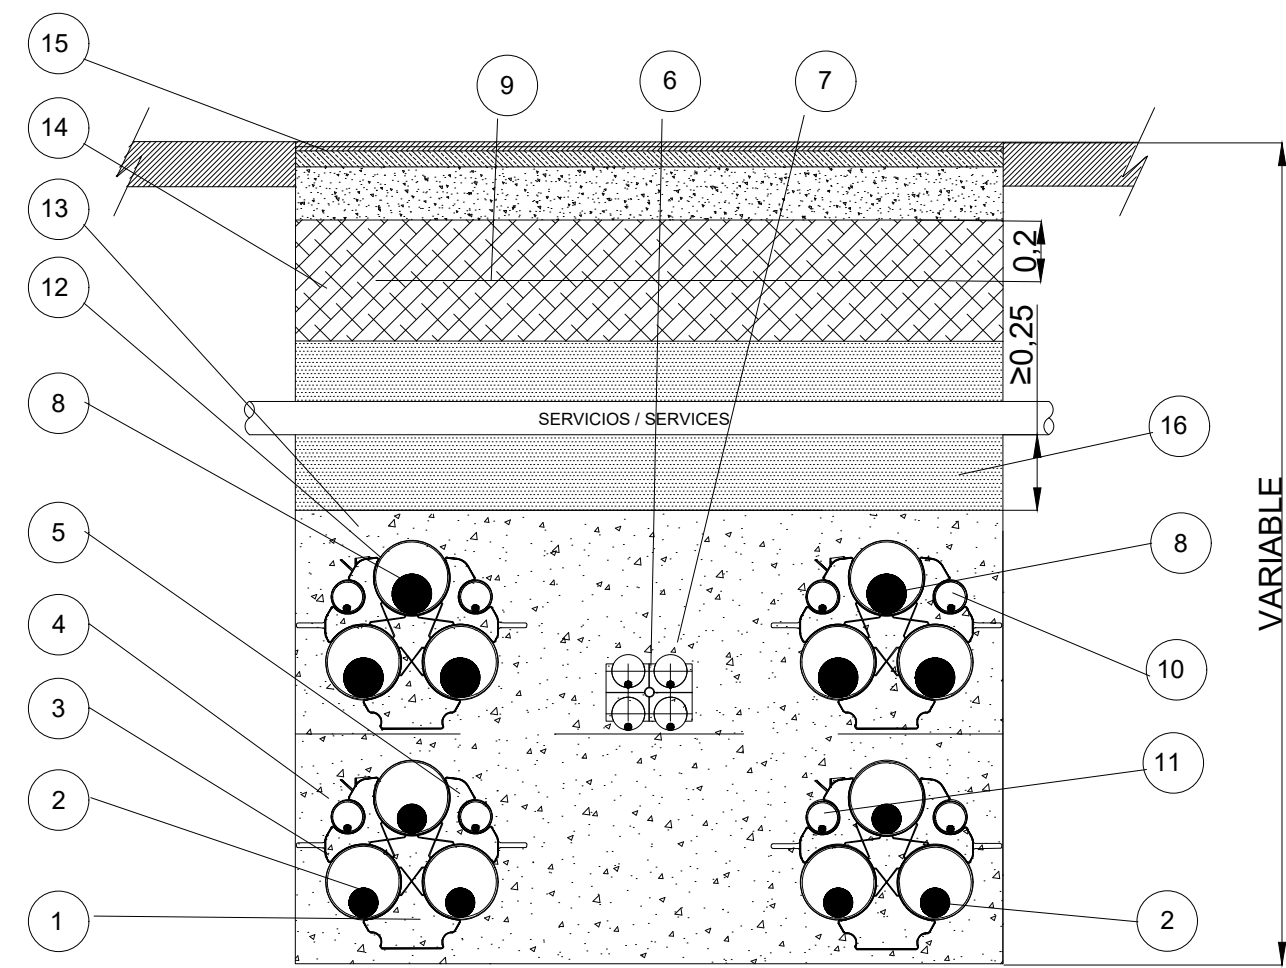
TYPICAL SECTION FOR CROSSING SERVICES (WATER PIPES) / DETALLE / 6 SECCIÓN TÍPICA PARA CRUCE DE SERVICIOS (TUBERÍAS DE AGUA)
